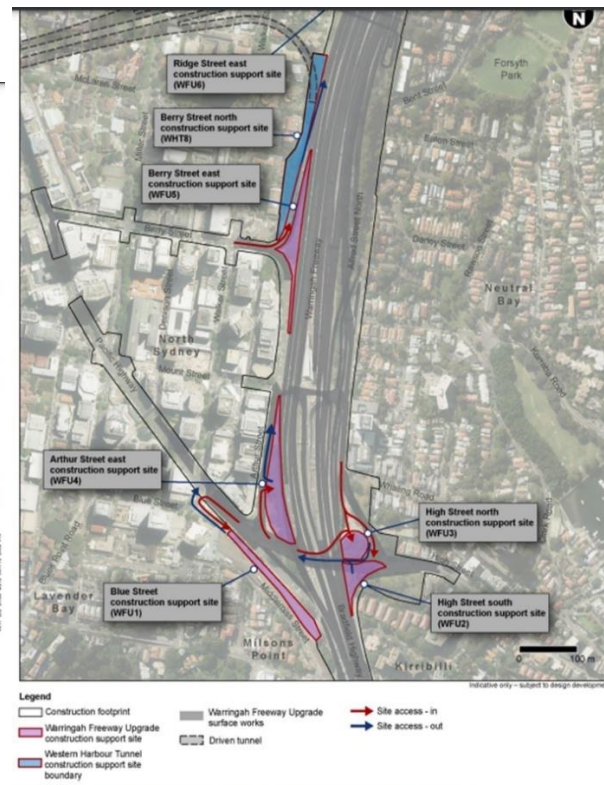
Warringah Freeway Upgrade construction support sites (map 1)
